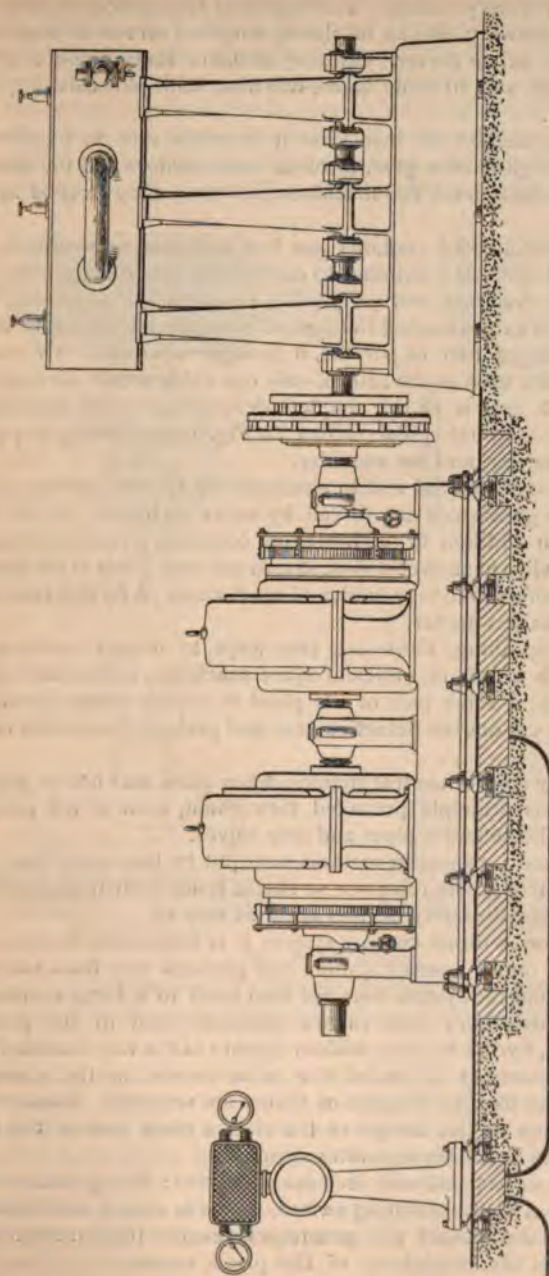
Cross-section showing Floor Construction and Plant for Direct-Current Series Generators.
